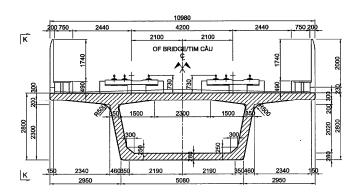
Typical Cross Section of PC Girder (L=40m)
